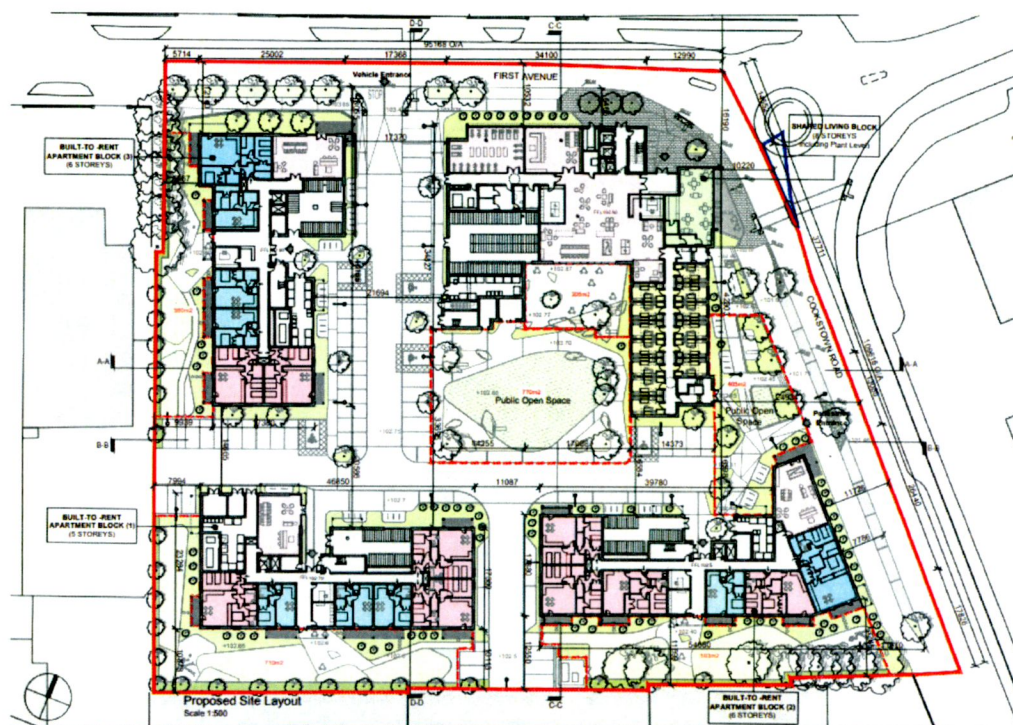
Site Layout Plan Submitted with ABP303911-19
